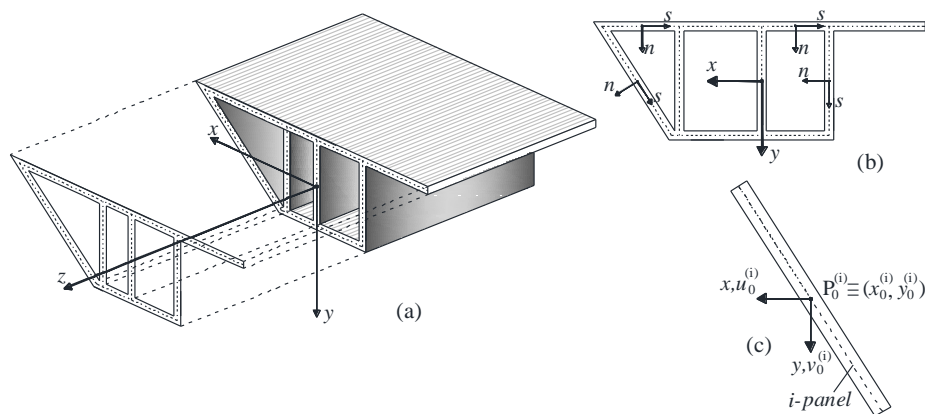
Generic beam (a); cross section (b); generic i -panel (c).
